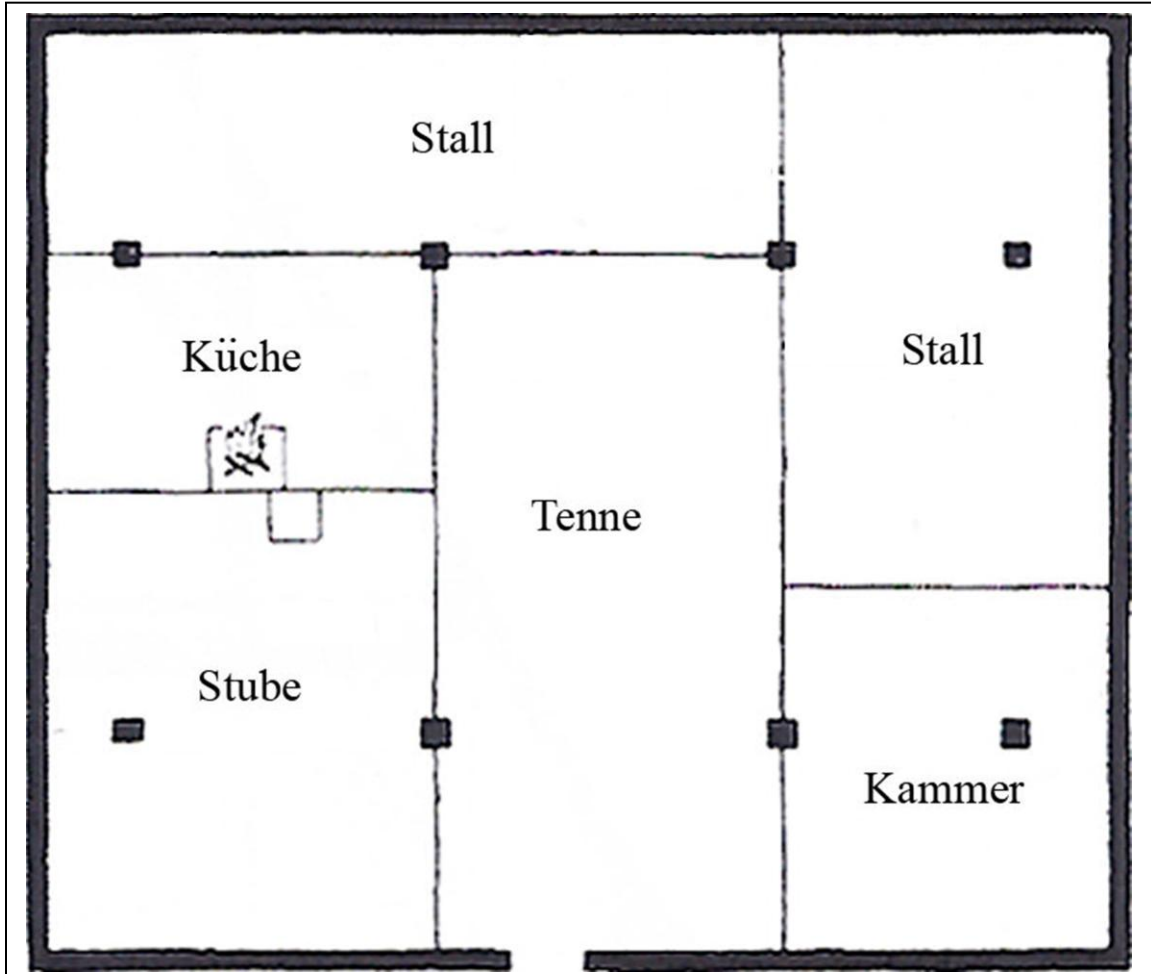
Reconstructed floor plan based on plan-net analysis, showing partitions that align with plan-net lines. Hans Hulscher house, aussere Bucherstrasse 33, Thon.
